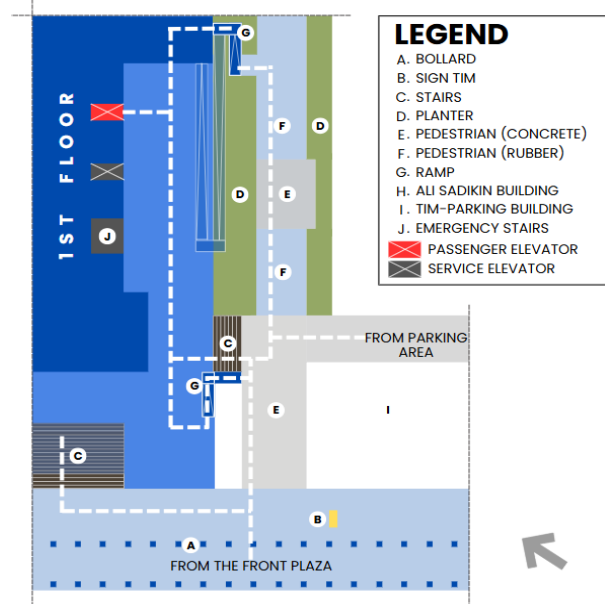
Schematic plan of the 1st floor circulation (Author 2025)
